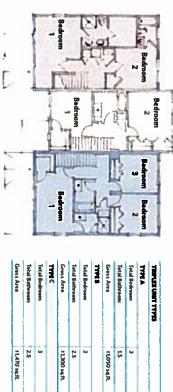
DETAILED SCHEMATIC UNIT DESIGN AND BUILDING ELEVATIONS ARE FOR GRAPHIC PURPOSE ONLY
